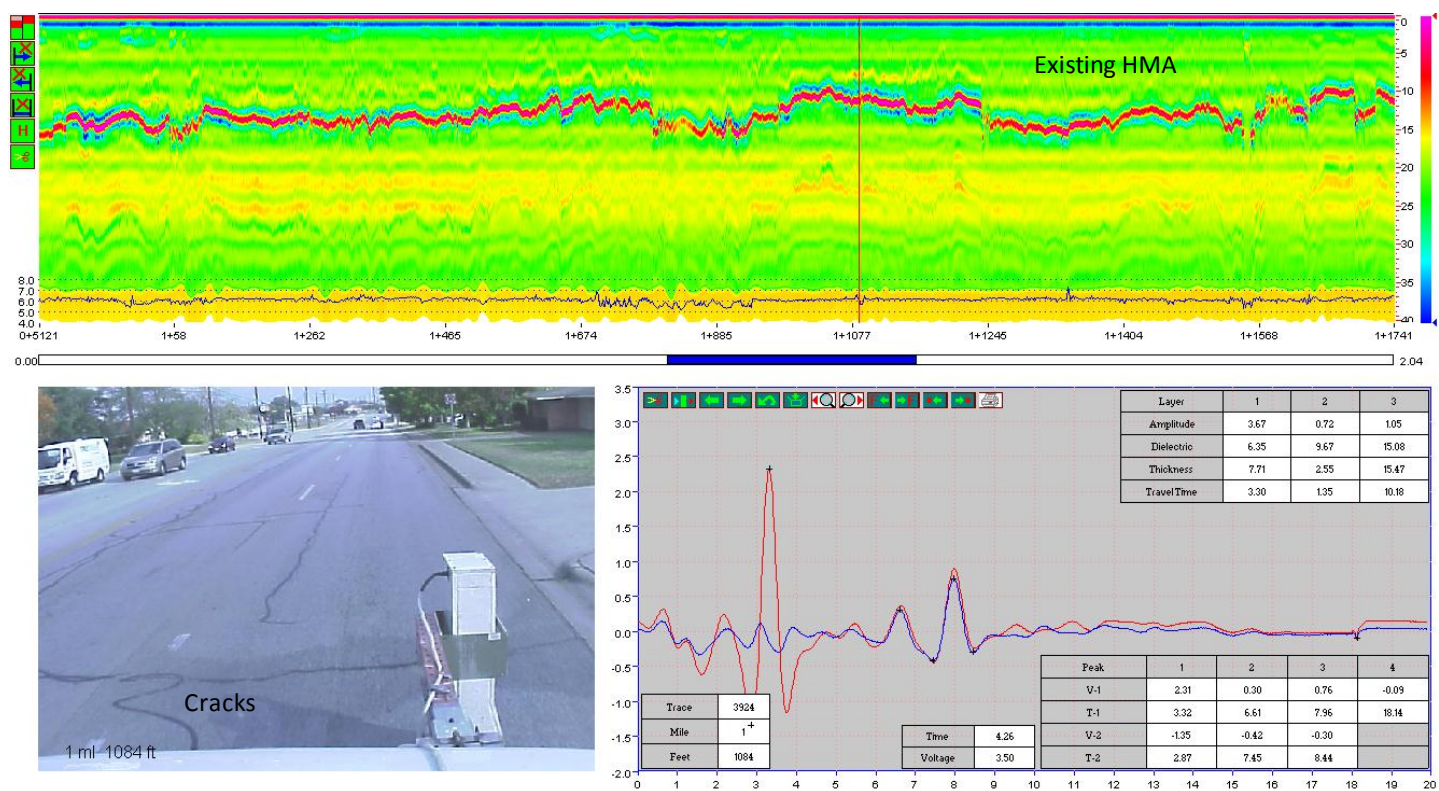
GPR Test Run on EB Outside Lane Prior to Overlay Placement.
